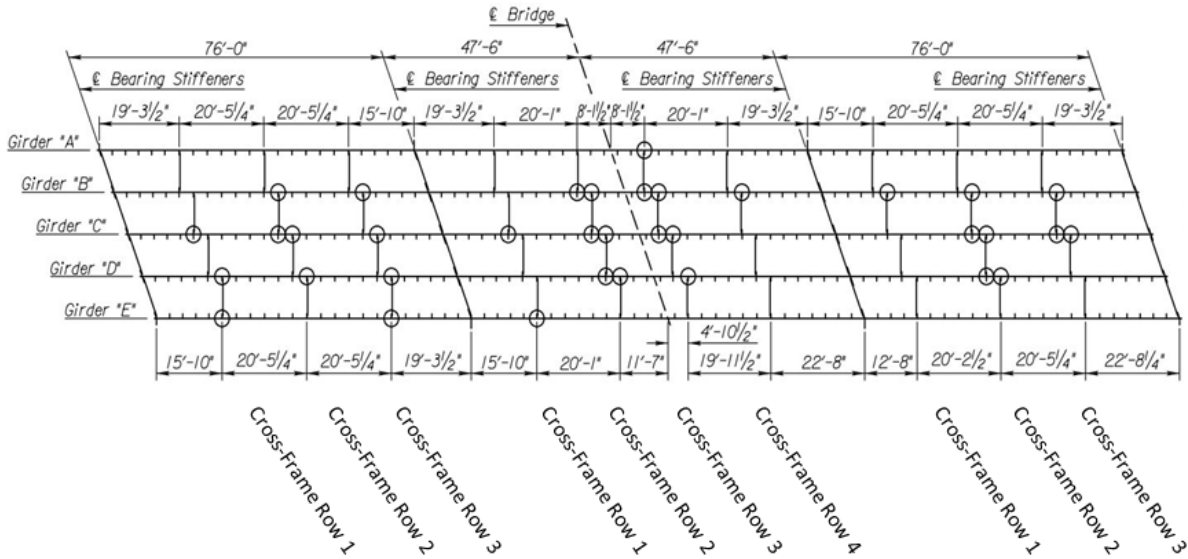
Crack locations in Bridge 43 carrying I-135 traffic.
